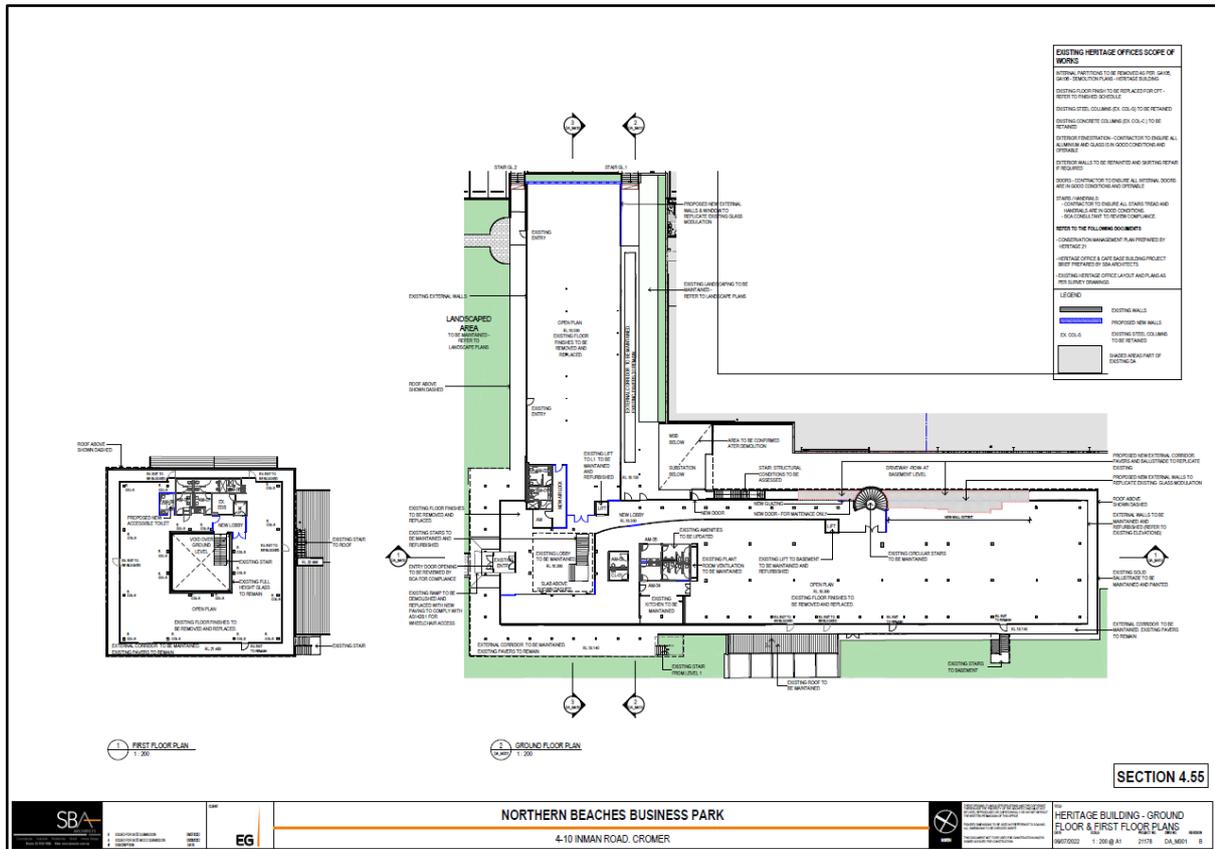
Heritage Building – Ground Floor & First Floor Plans
